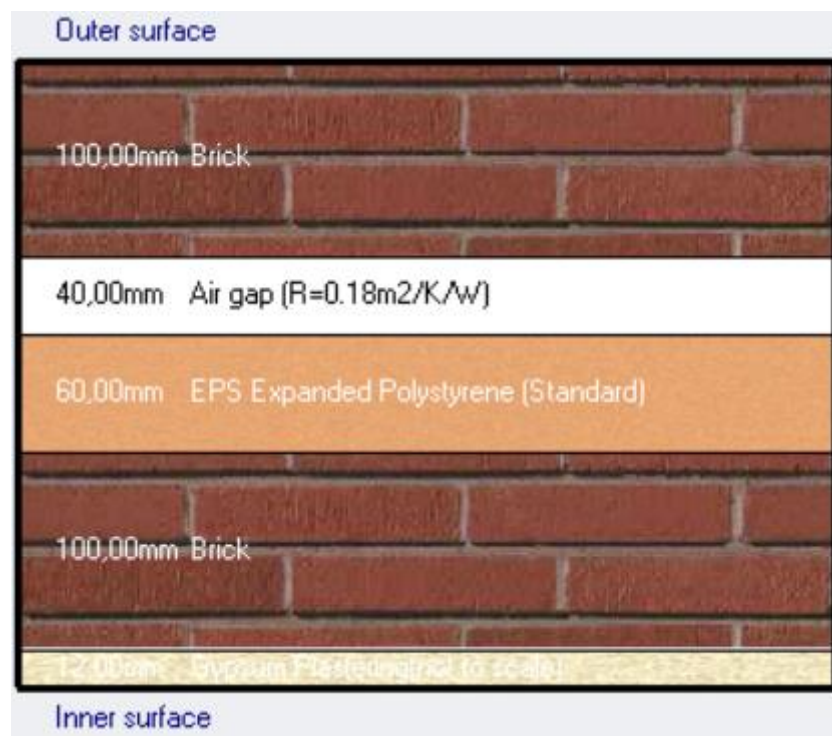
Detail of the exterior wall of the freestanding house in DesignBuilder (low insulation)
